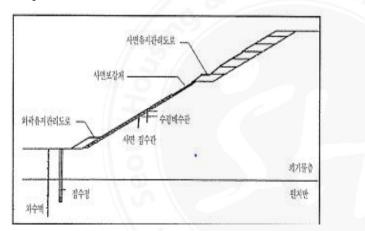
Design concept of slop stabilizing facility for Nanjido Landfill Stabilization
